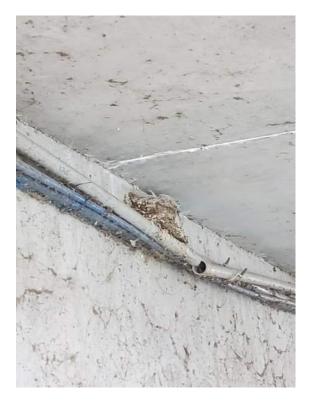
View of a Barn Swallow nest on cables in the unnamed concrete bridge northwest of Bridge 2 (B2). June 23, 2022.
